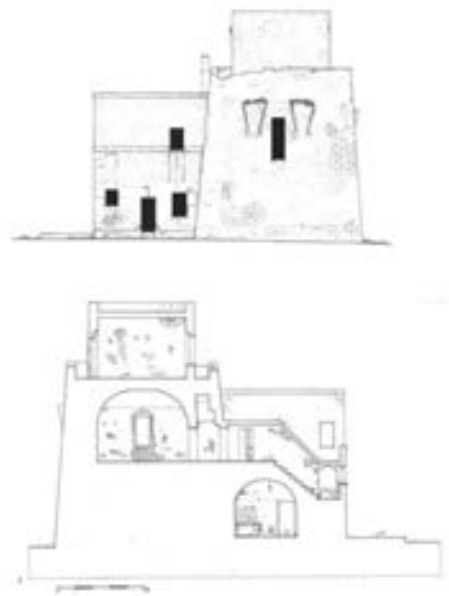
Elevations and sections of Saturo Tower, Scalzo M. (1982).
